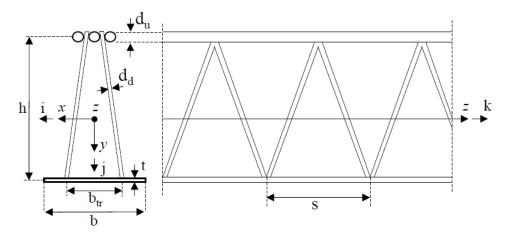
Schematic view of the truss element (left: cross-section; right: side view).
